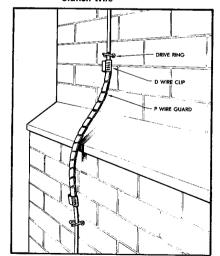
Drop Wire Crossing Masonry Building Projection
